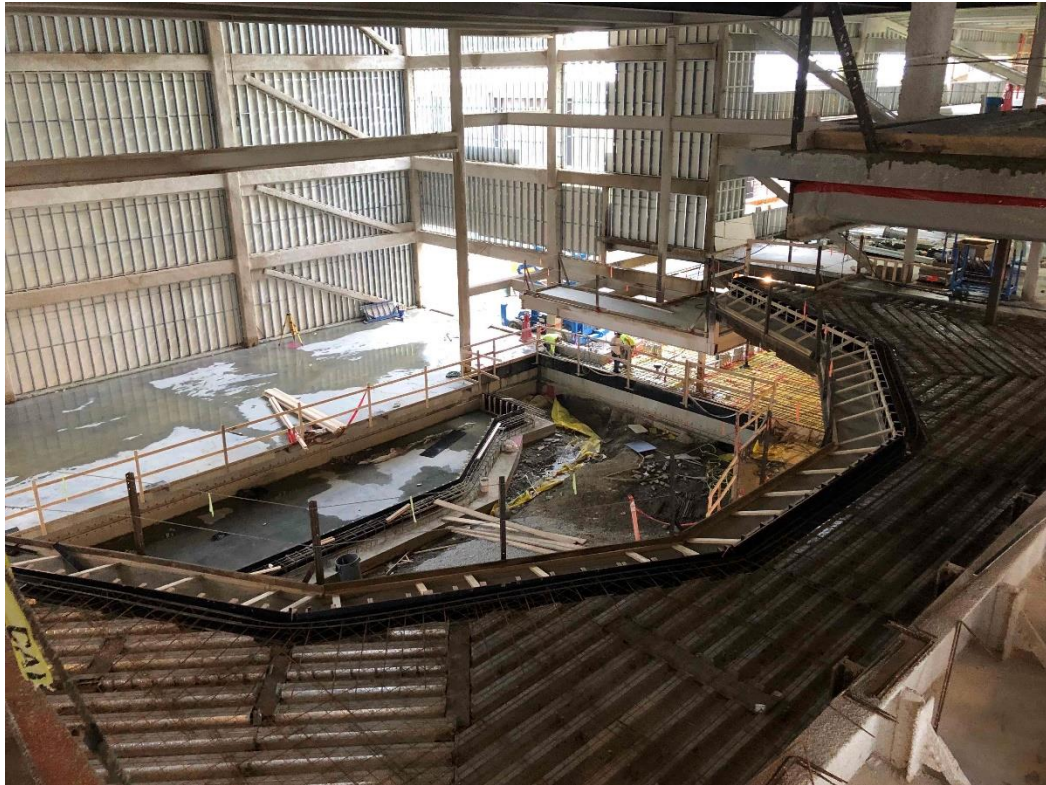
Auditorium Rebar and Mesh in Place for Upcoming Slab on Deck Pours.
